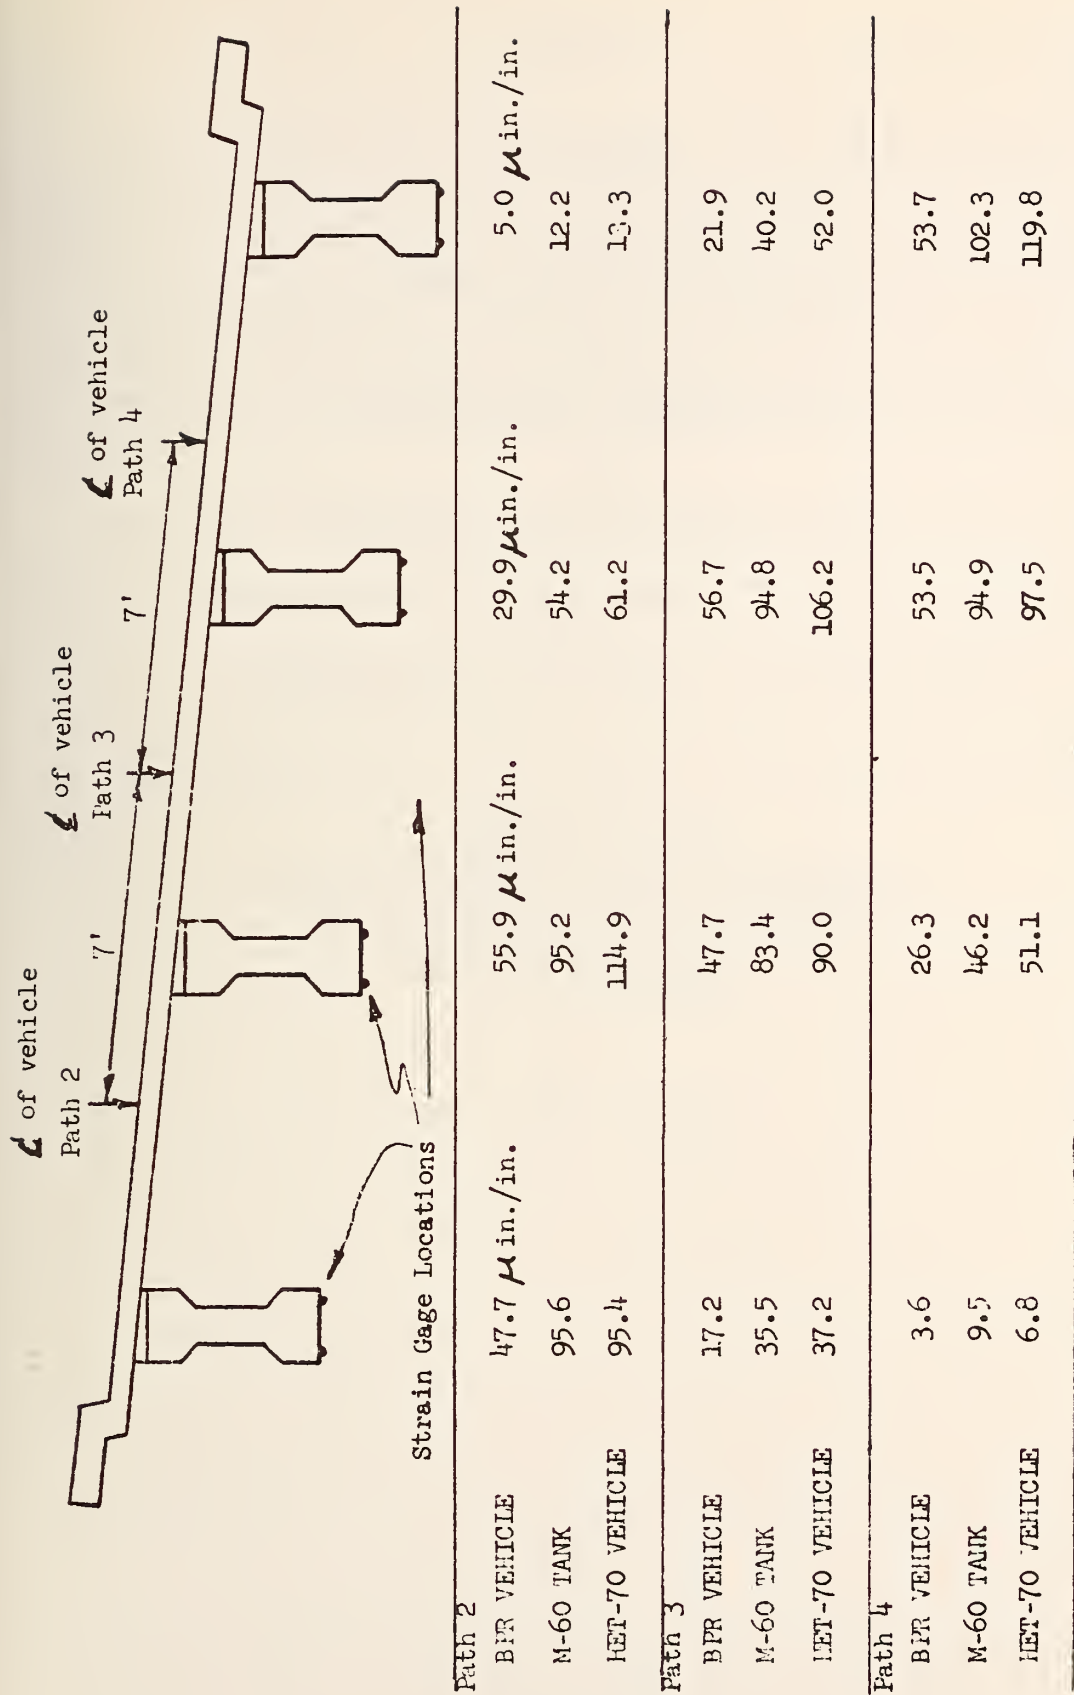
MAXIMUM BENDING STRESS FOR PRESTRESSED CONCRETE
